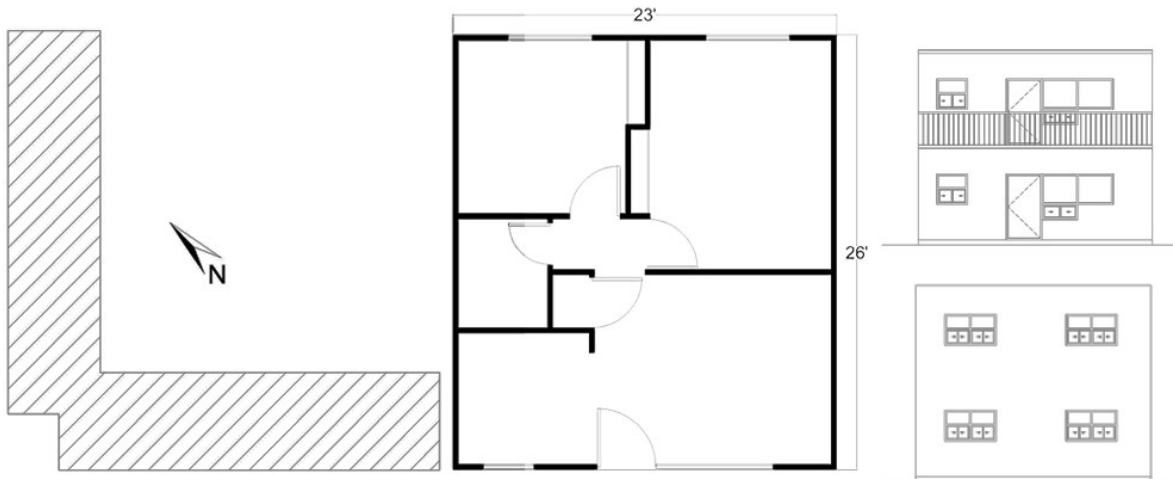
From L-R: Building, two-bedroom apartment unit, front elevation (top), back elevation
